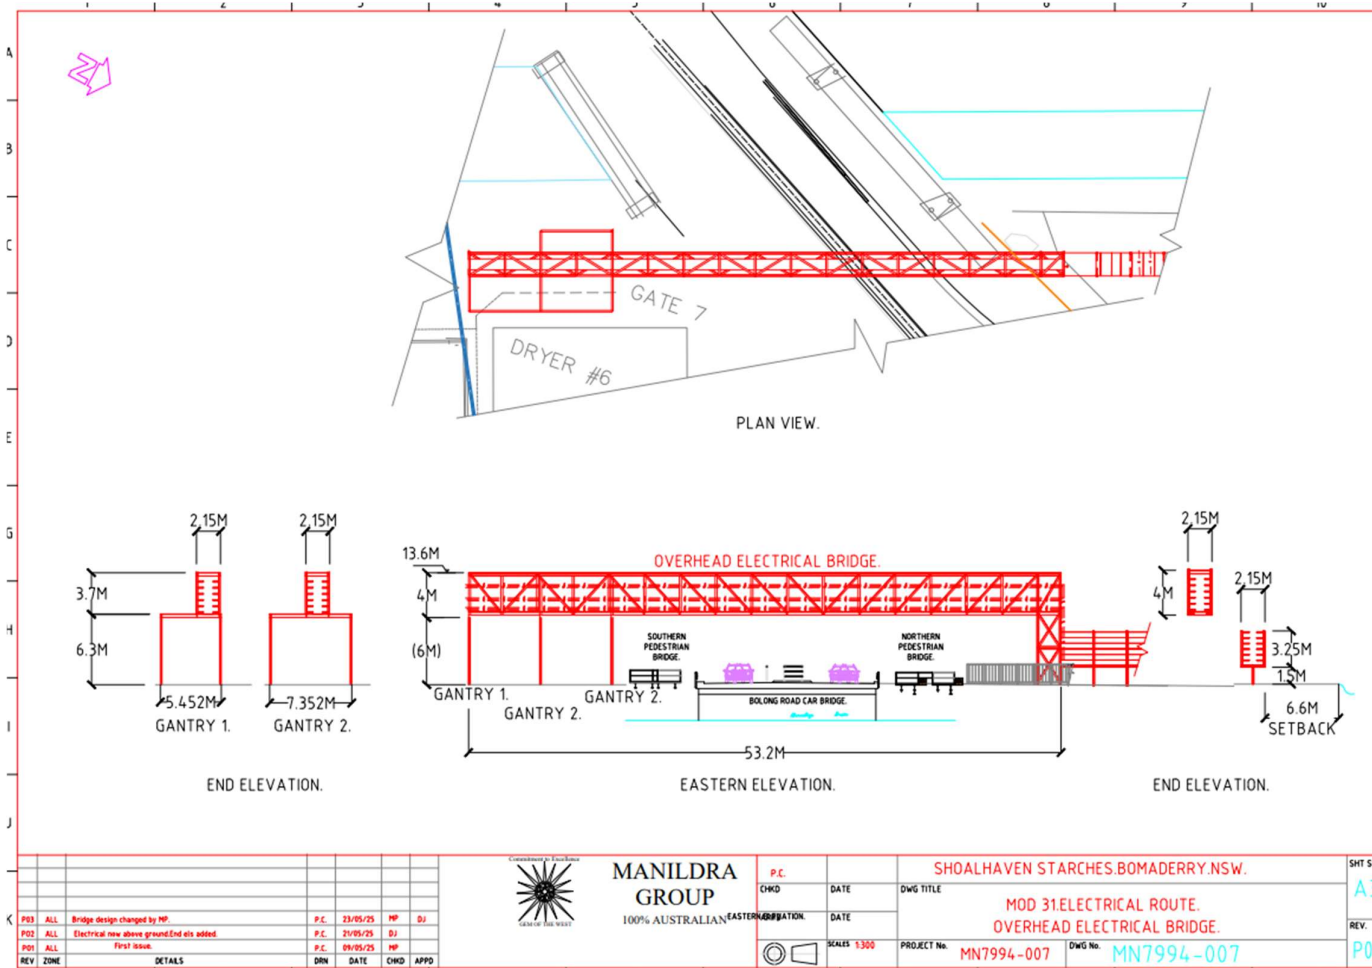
Proposed Overhead Electrical Cable (Source Shoalhaven Starches)
